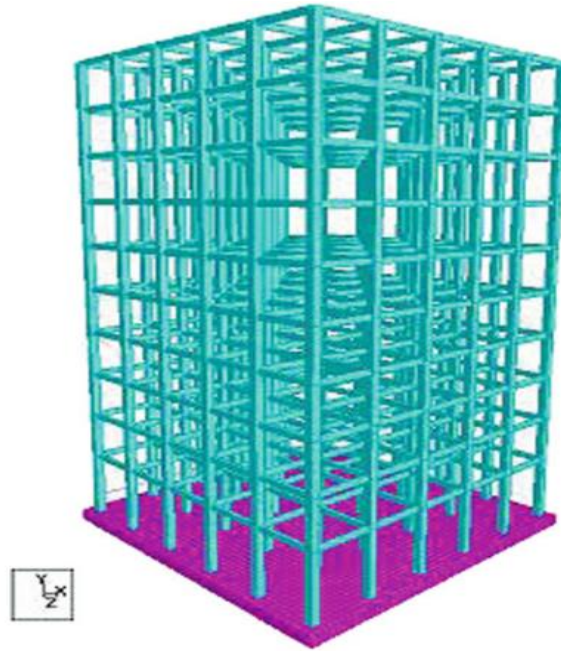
Three-dimensional view of multistoreyed building with raft foundation
